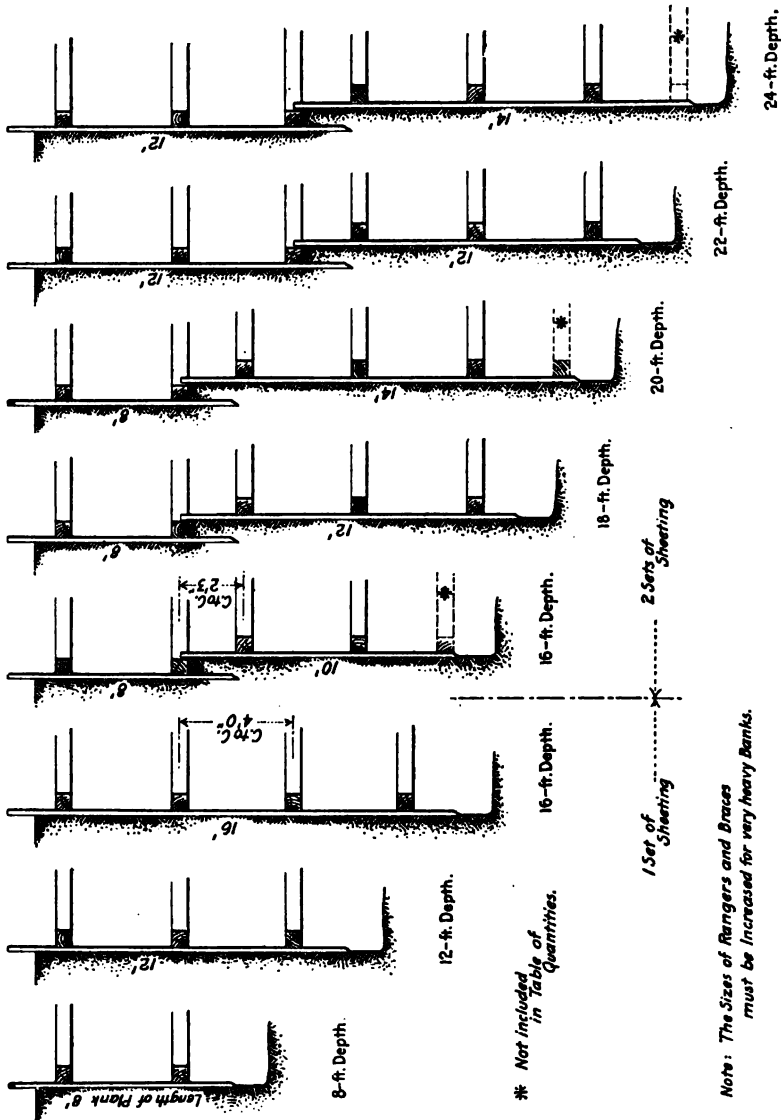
A method of shoring ordinary narrow sewer trenches.
